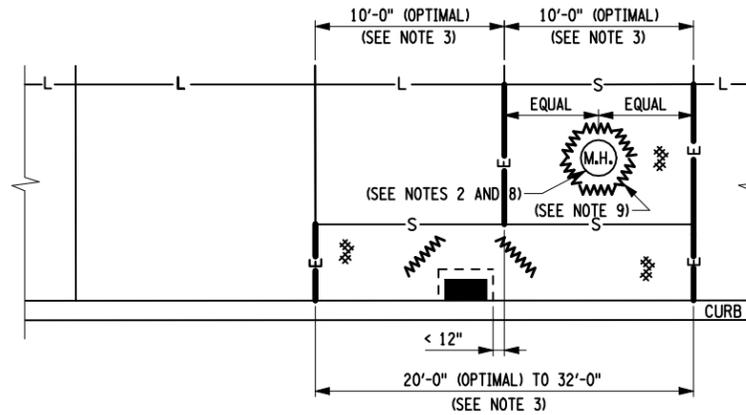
DETAIL "C" - OFFSET SINGLE SLAB ISOLATION
